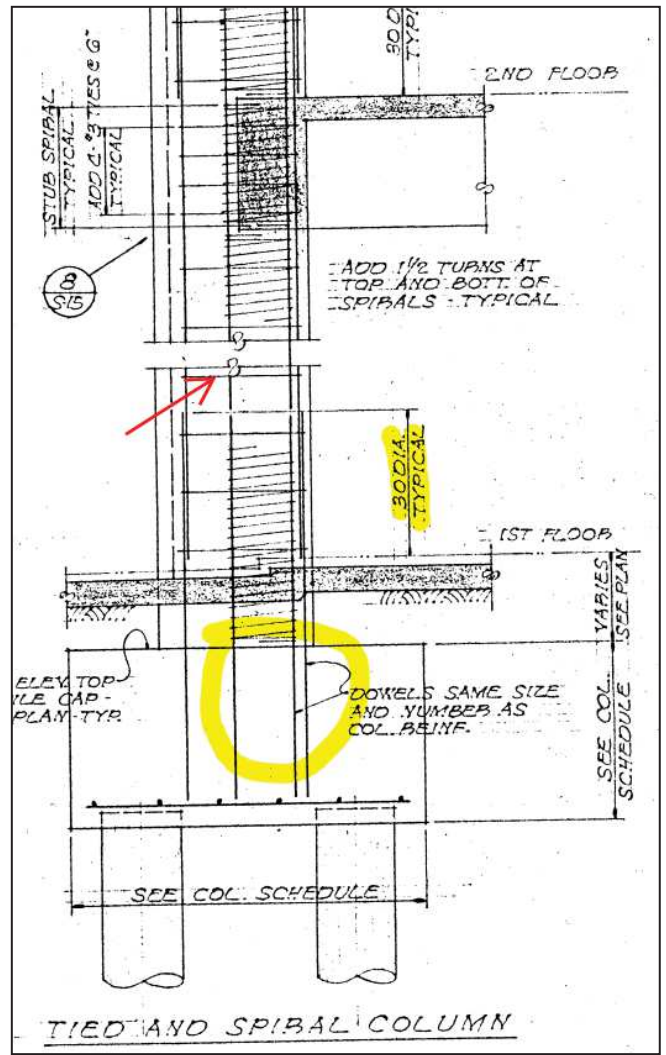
Original construction drawing showing column to pile cap connection, column bar lap length and column tie configuration
